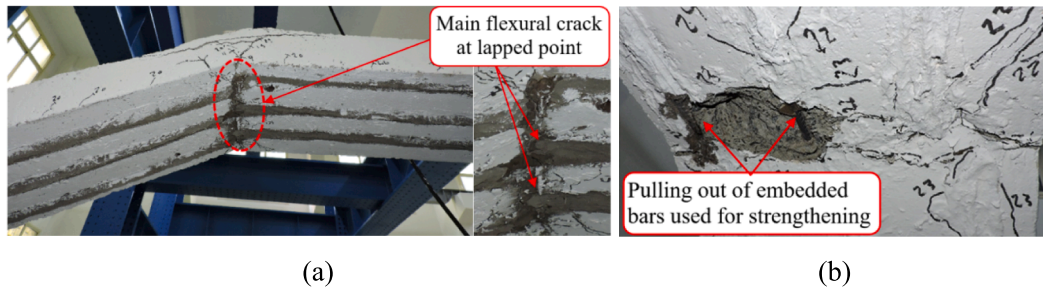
Crack patterns of slab S-N-10D: (a) main flexural cracks; (b) pulling out of embedded bars used for strengthening.
